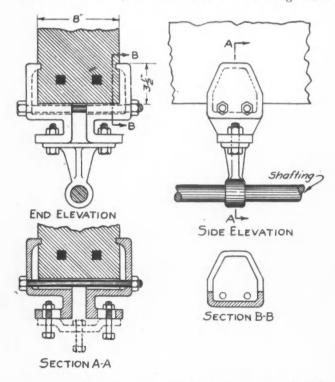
Machinery Clamp for Fastening Machinery to Concrete, Wood Beams, Columns, Walls, Floors and Ceilings.
